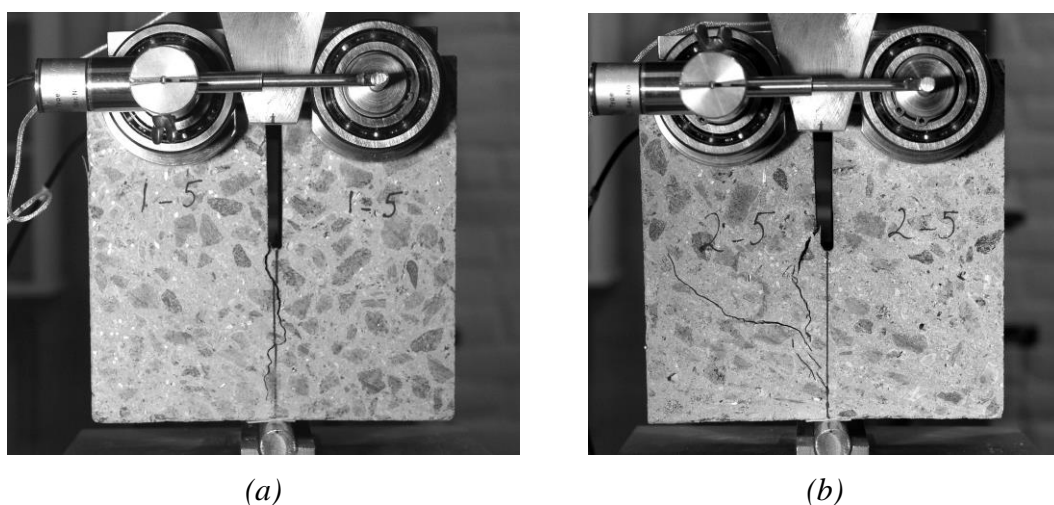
Pictures showing cracks in WST specimens: (a) with only a vertical crack and (b) with horizontal cracks.
